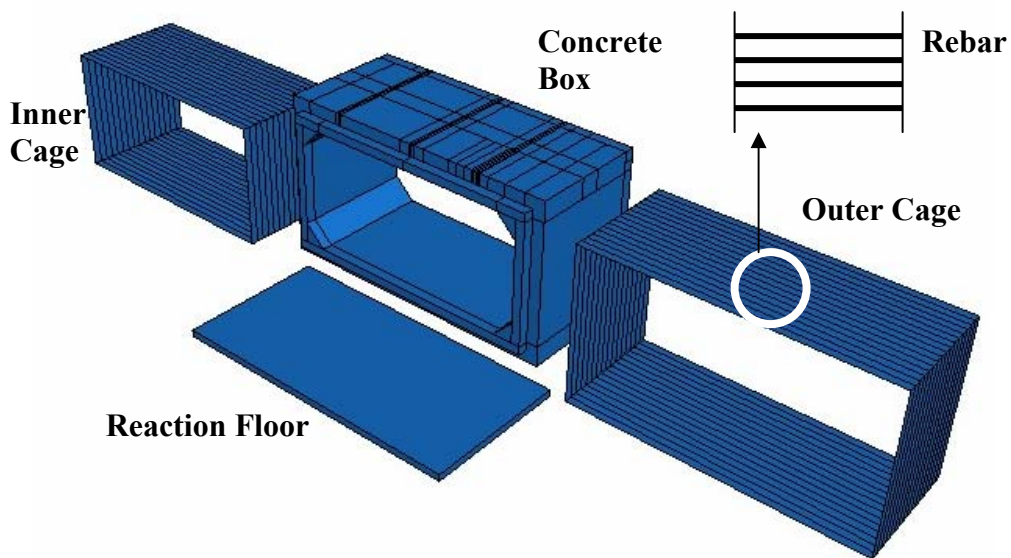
Parts Showing Inner Cage, Outer Cage of Rebar with Concrete Box and Strong Reaction Floor
